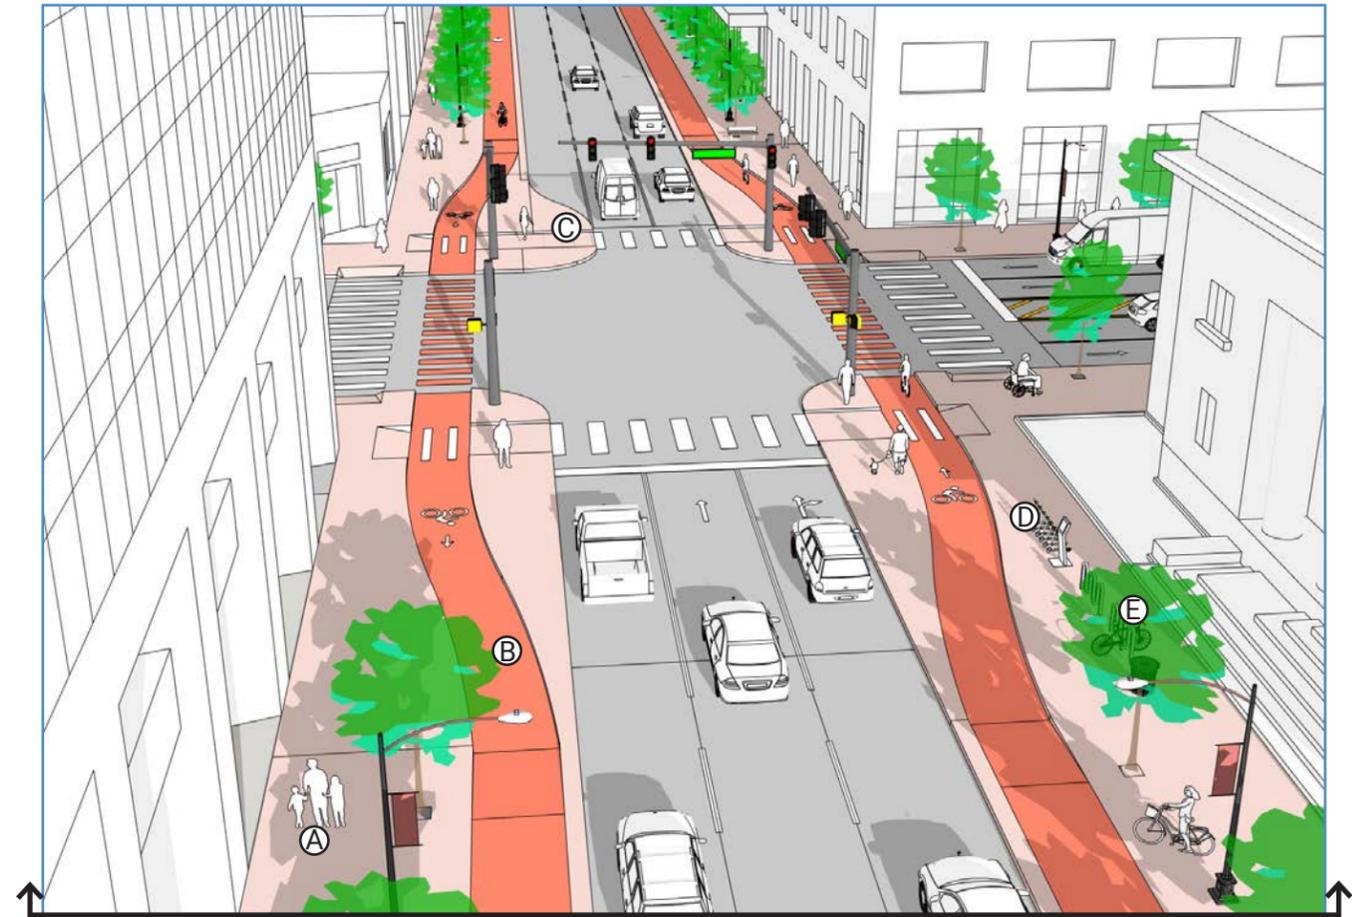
Sixth Street Looking West at Lavaca Street
